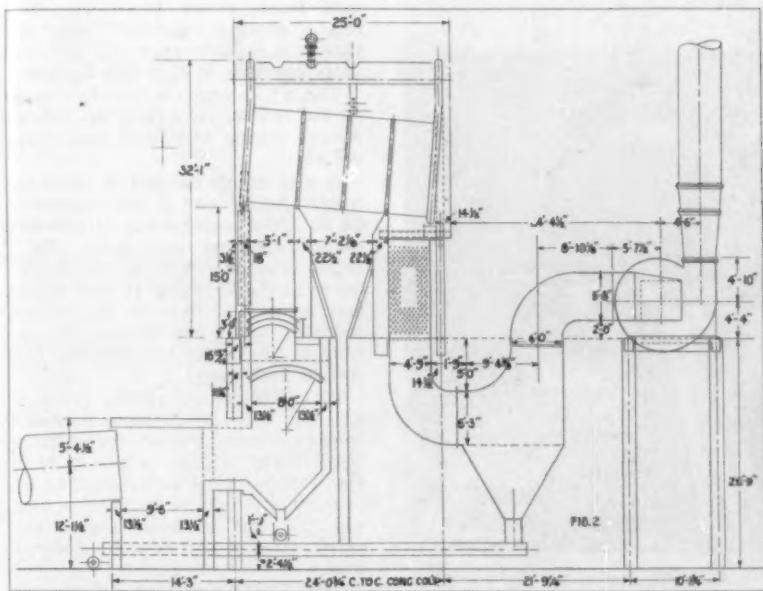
Longitudinal section showing setting for new waste heat boiler
